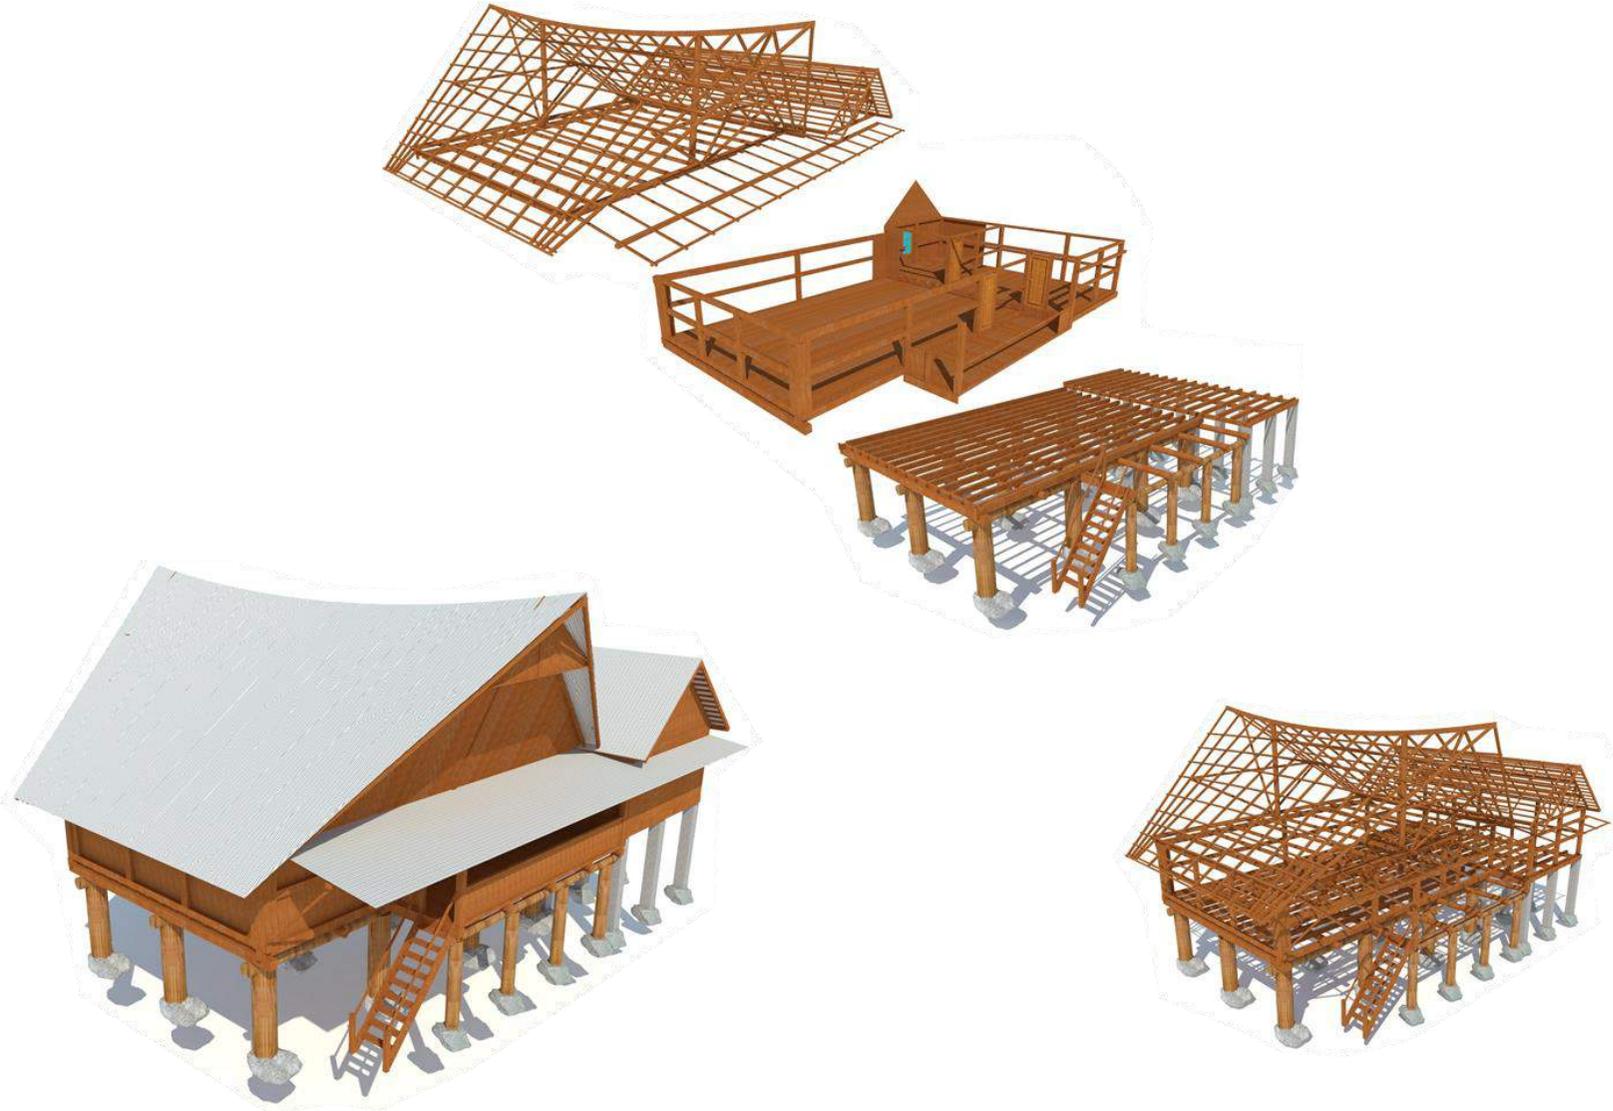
The detailed construction of a traditional house in Bangke village (Example 1) with the extensive arch roof. Source: Author, 2018
